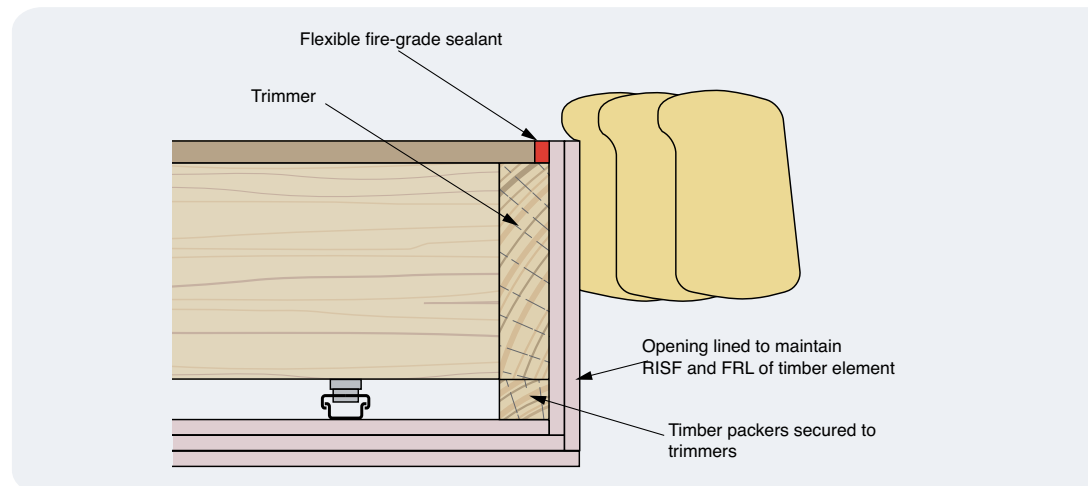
Typical riser penetration detail through a fire-protected timber floor.
